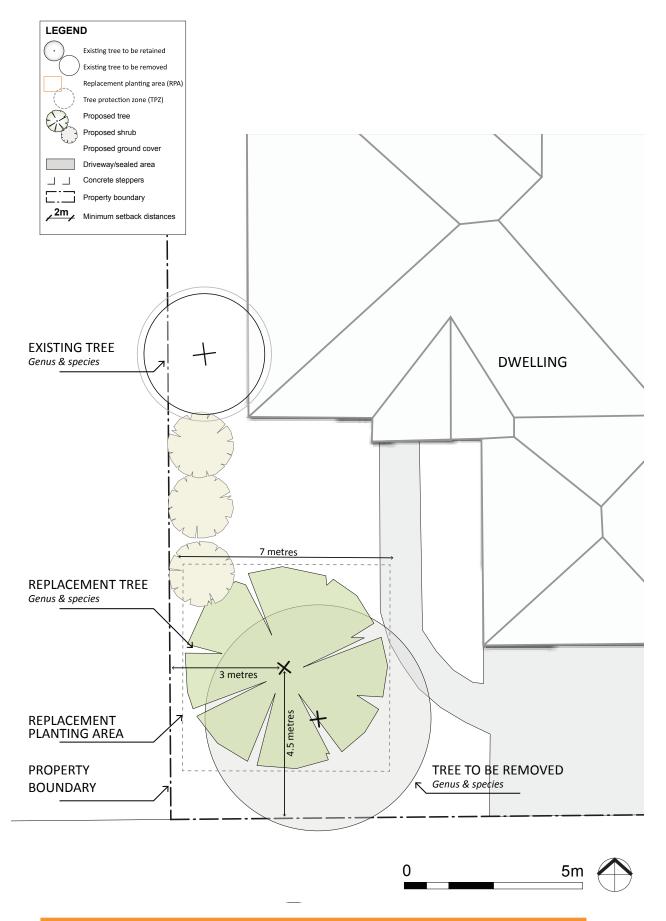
EXAMPLE OF A REPLACEMENT TREE PLANTING PLAN
